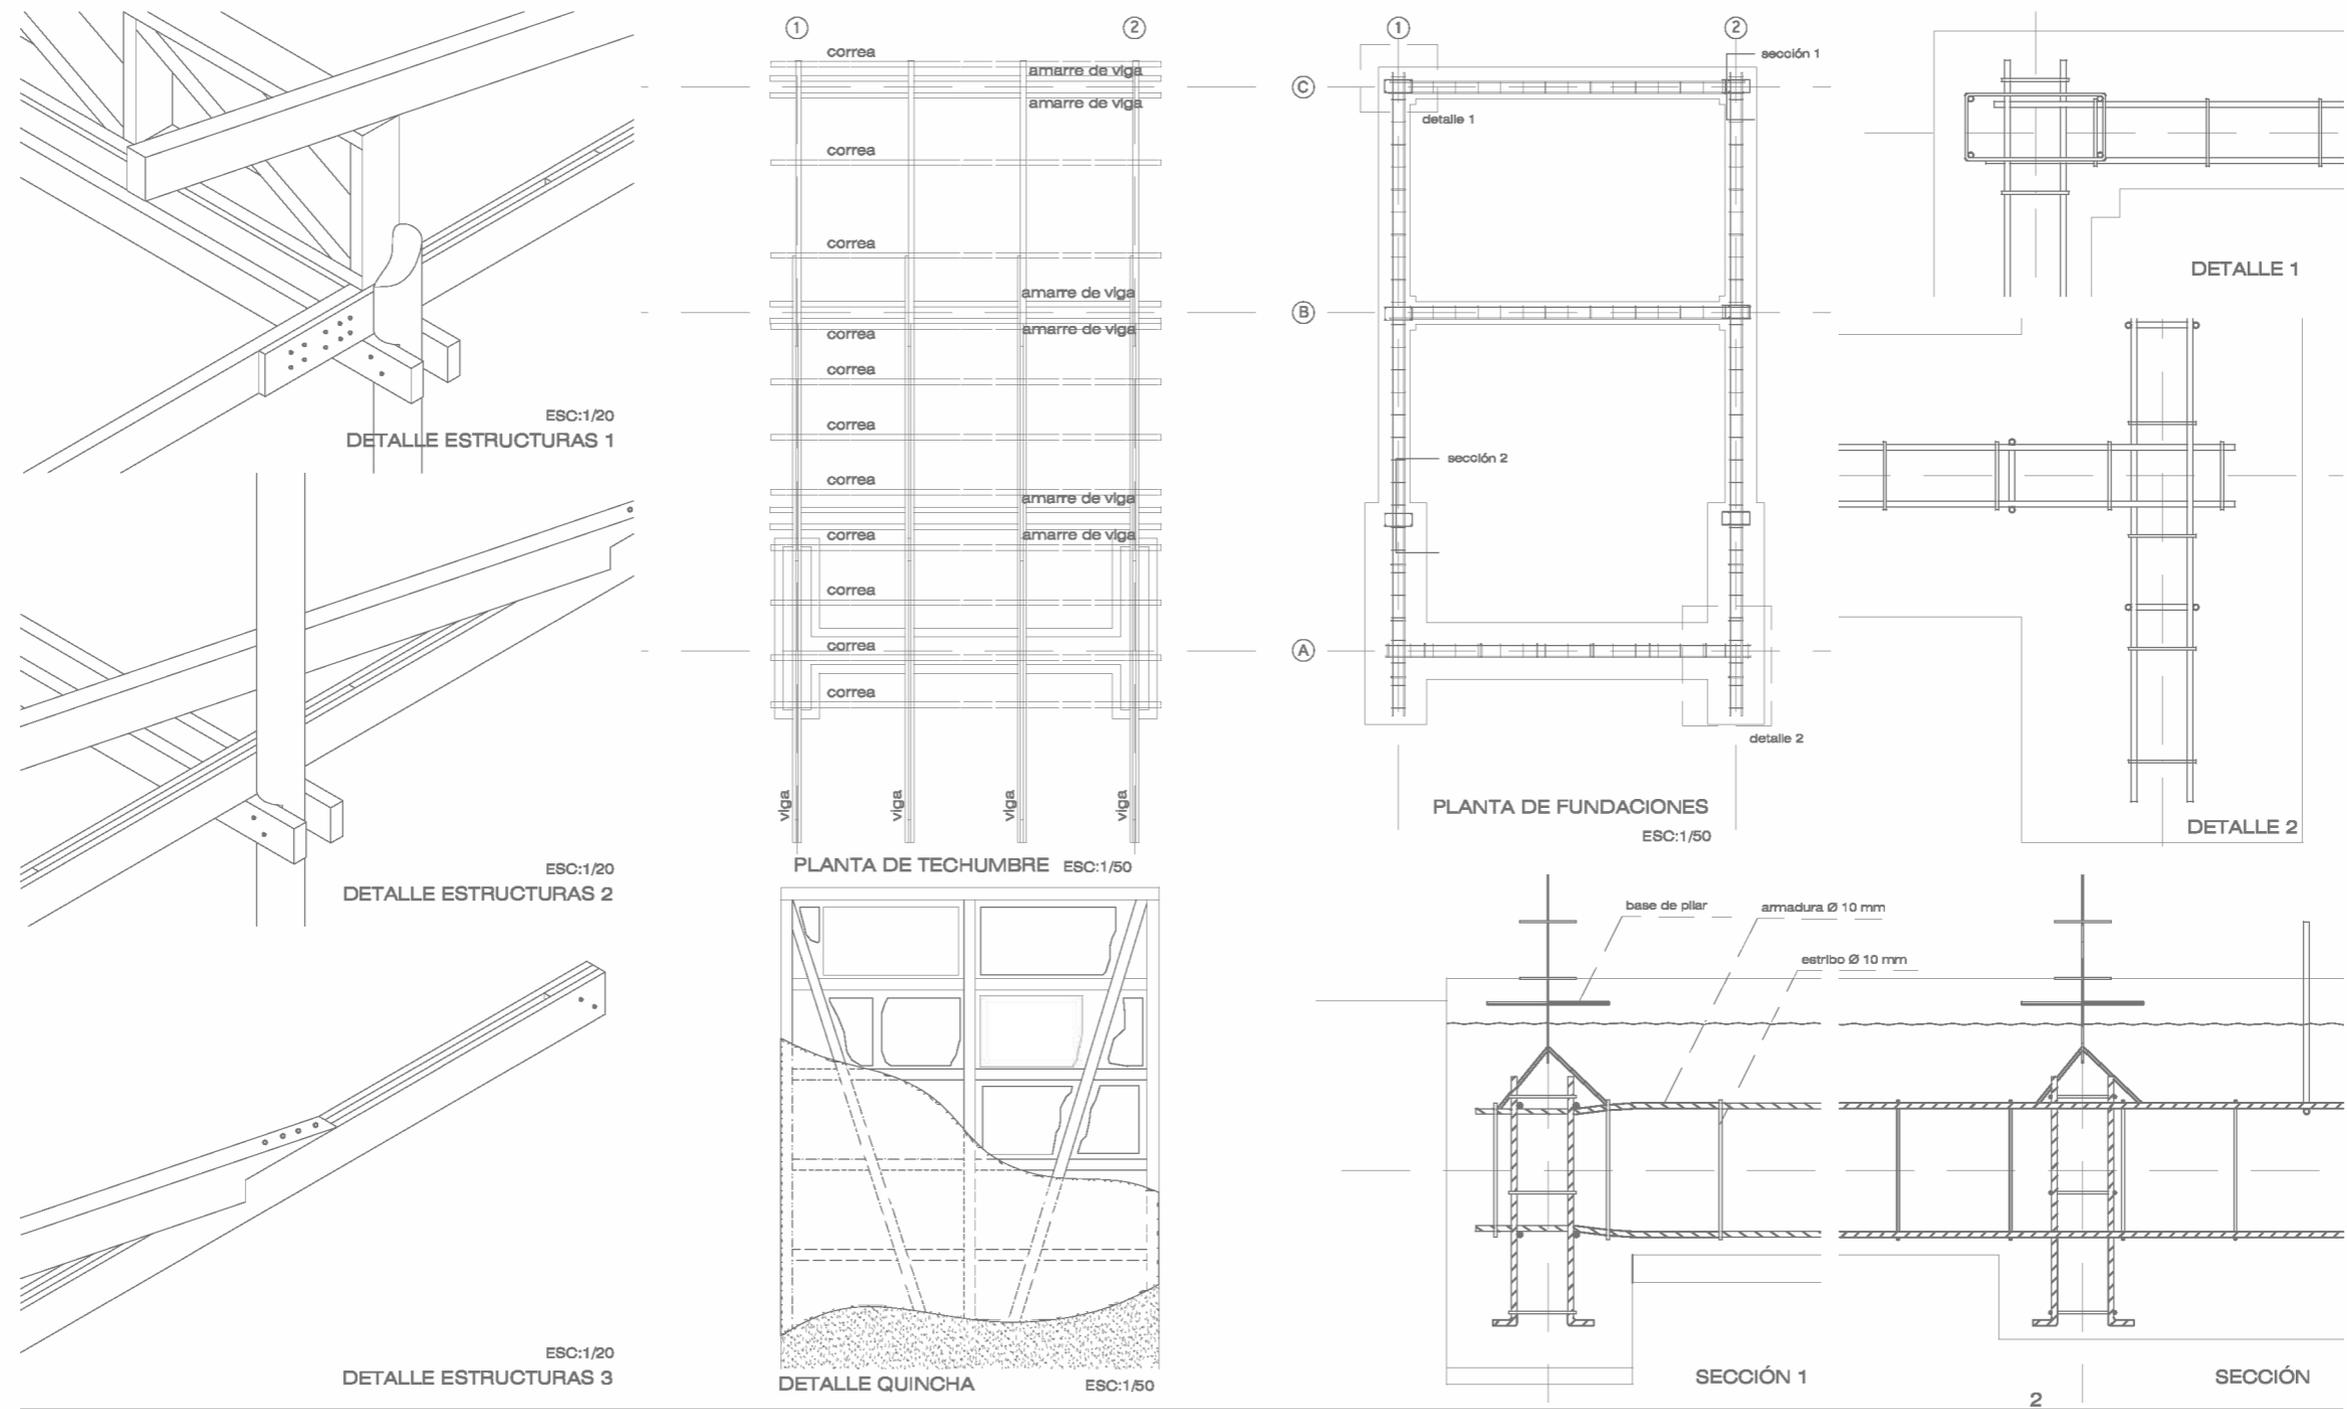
Constructive Details (drawing by Óscar Natividad)
